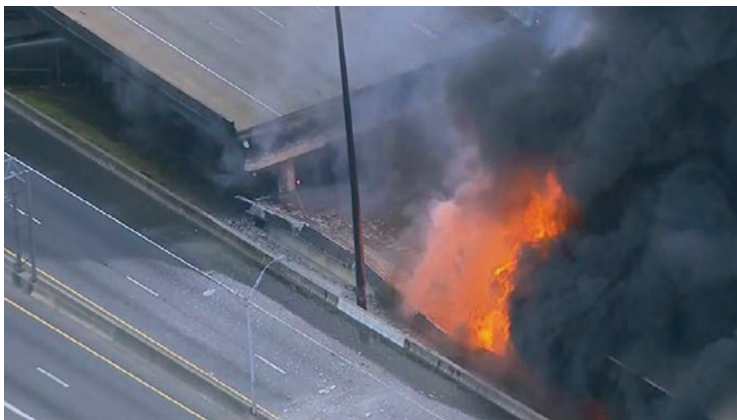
Fire-induced collapse of I-85 bridge section, Atlanta, GA, USA [62]. (Photo placed under public domain)
